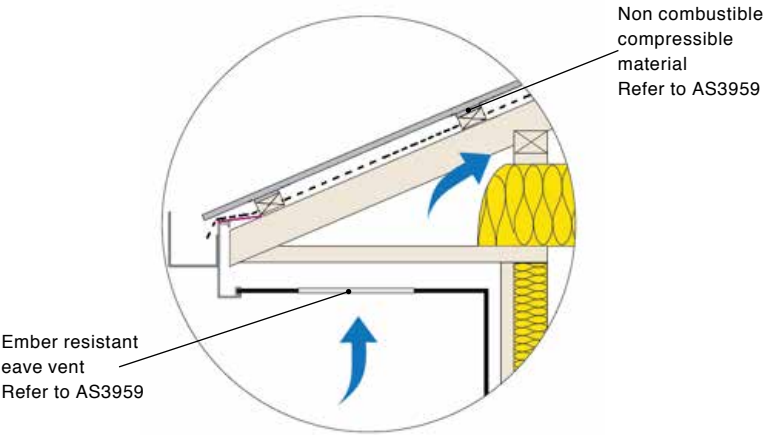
Eaved roof with eave vent with some bushfire considerations shown
